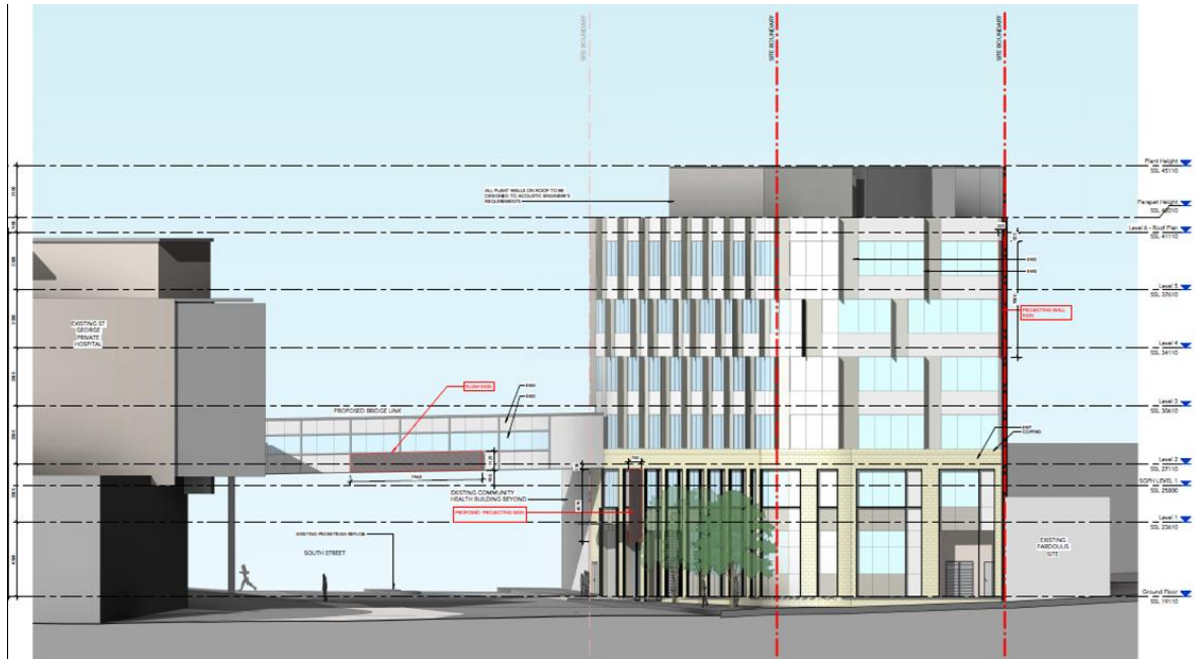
Proposed East Elevation of 131 Princes Highway (Source: Architectural plans prepared by Team 2 Architects, 2017)
